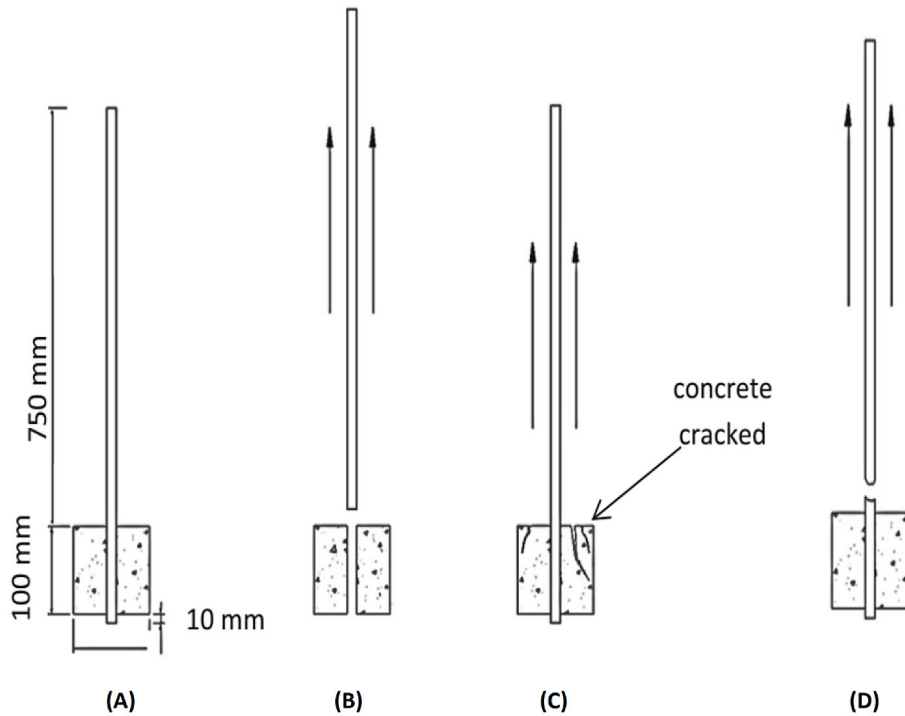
Typical bond failure modes observed in the pull-out test: (A) original specimen, (B) pull-out failure of the reinforcing bar, (C) concrete splitting failure, and (D) rupture of the reinforcing steel [26]
